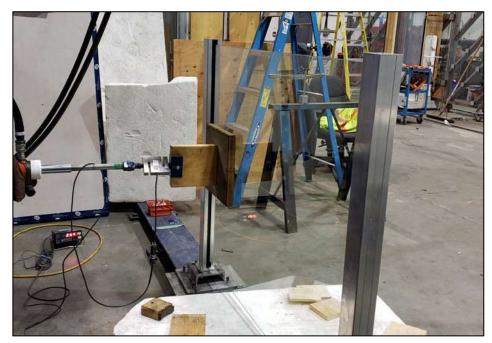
4 ft. Vista Frameless Glass Railing System – In-Fill Load Test
